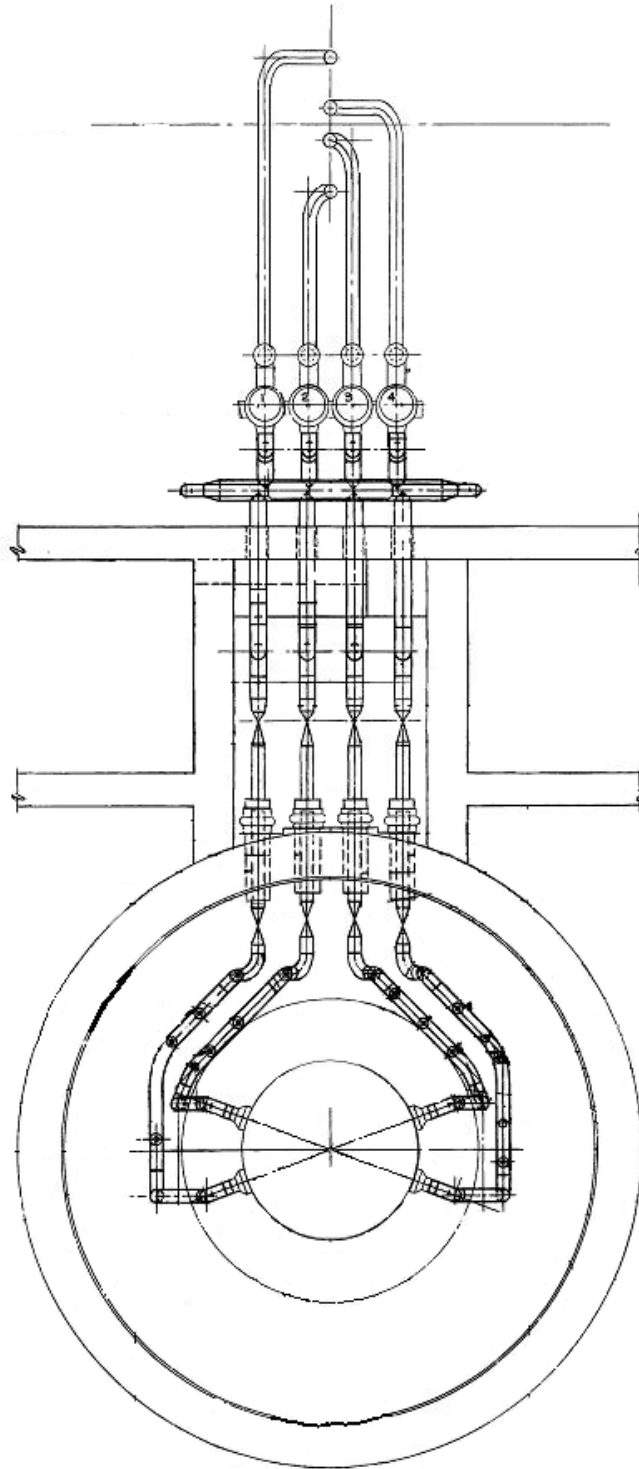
Typical MSL Layout Between RPV and Turbine (Plan View)
